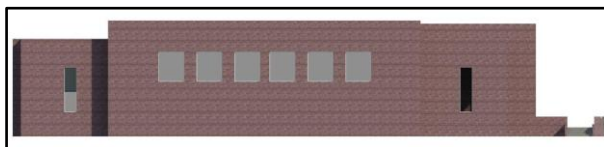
17 are elevations of the exterior walls which show how the façade of Building E changed due to the window replacement. For interior perspectives and exterior models, see Appendix B at the end of this report.
